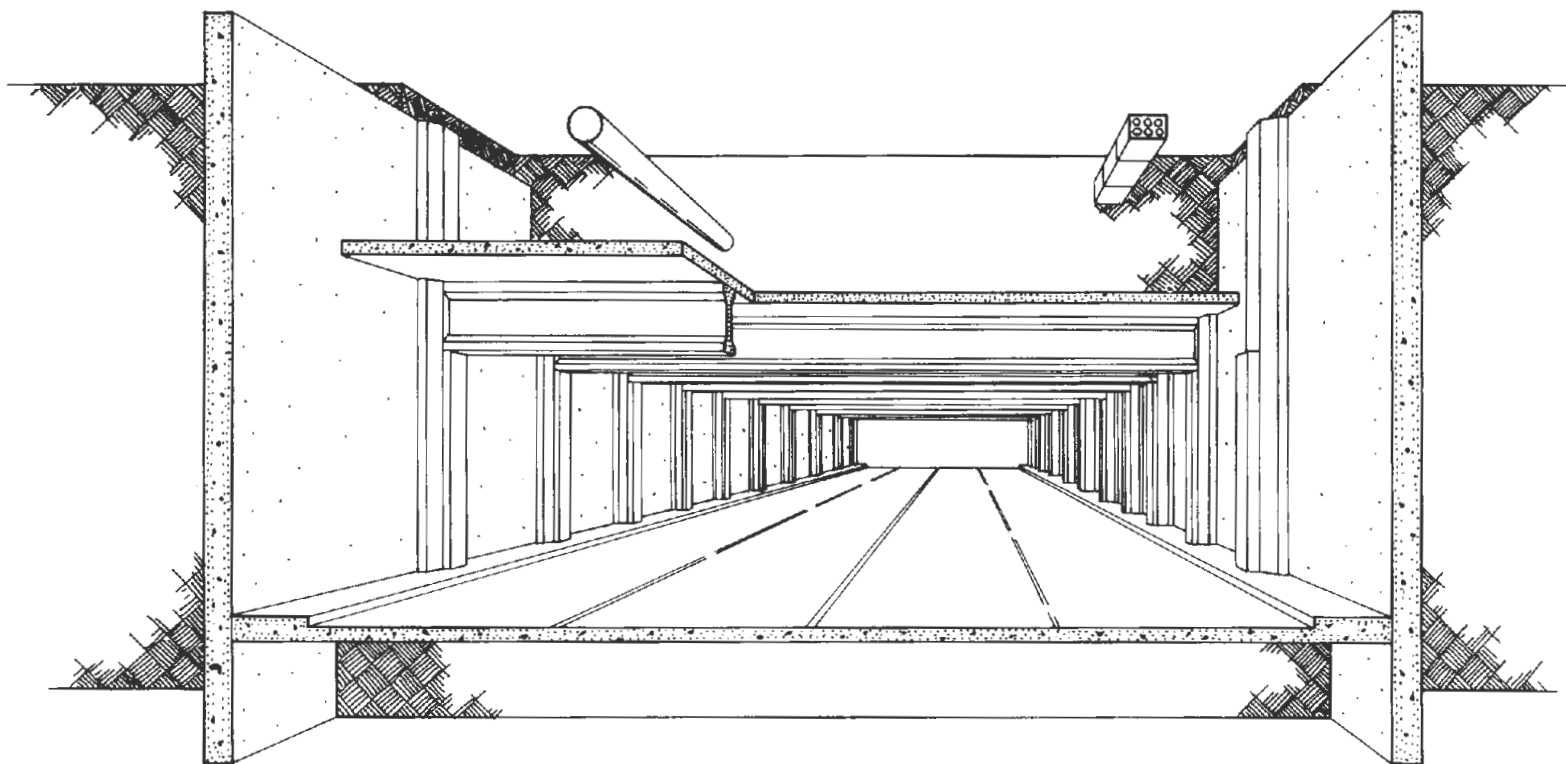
King pile wall system with spaced girders as tunnel roof.
